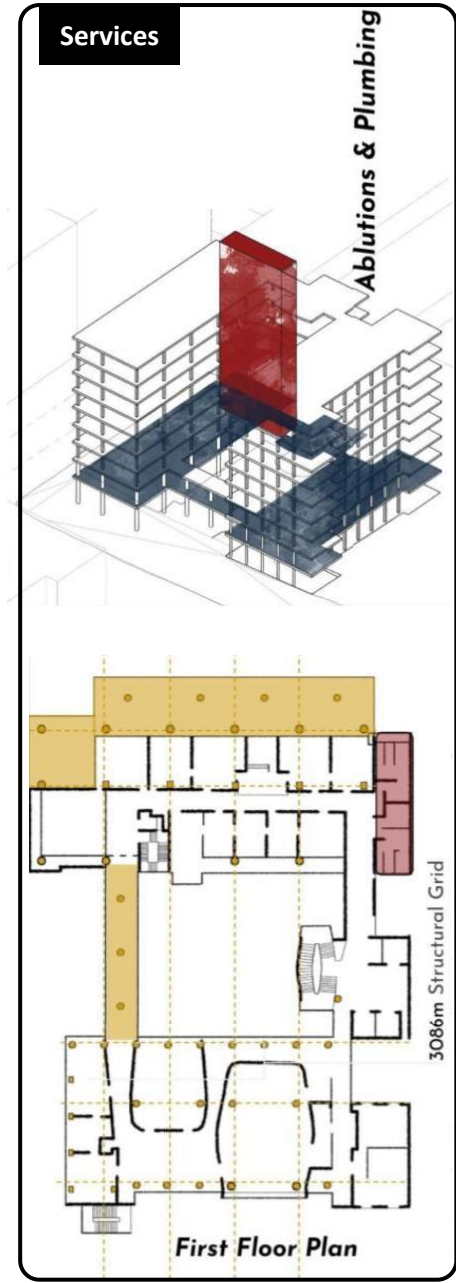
Building Axo (top) and First Floor Plan (bottom) showing Ablutions Block (red) and closed off public space (yellow)
